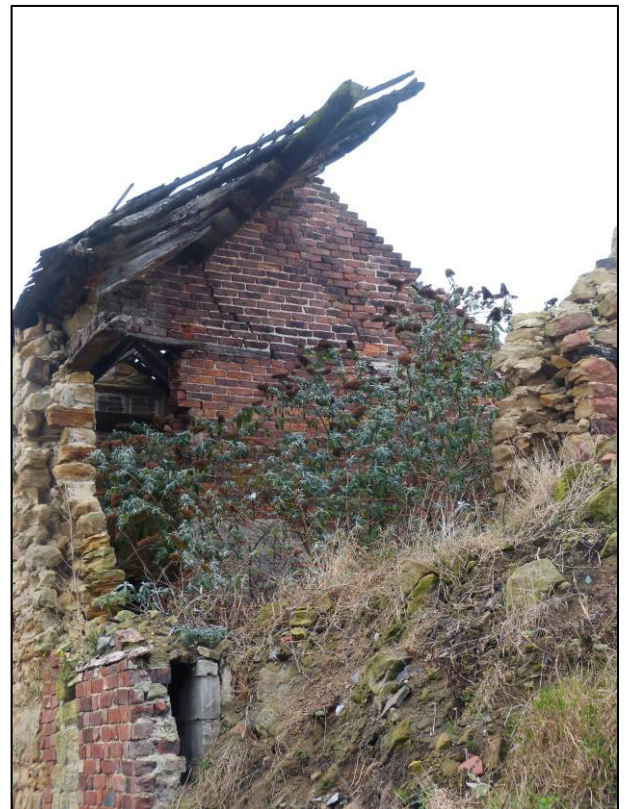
East range, south part, first floor internal doorway, looking NE (photo 1/400).
